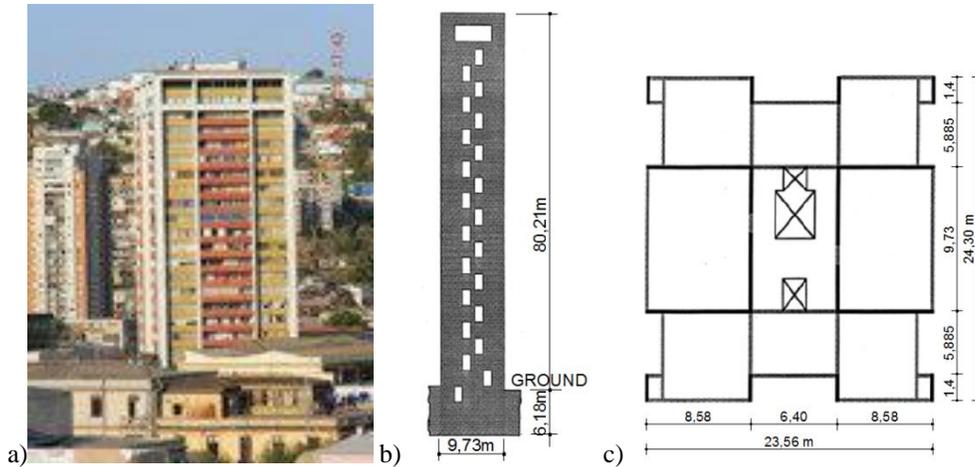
Torre del Amendral building in Valparaiso Chile [2.22]: a) photo b) vertical section, c) horizontal section
